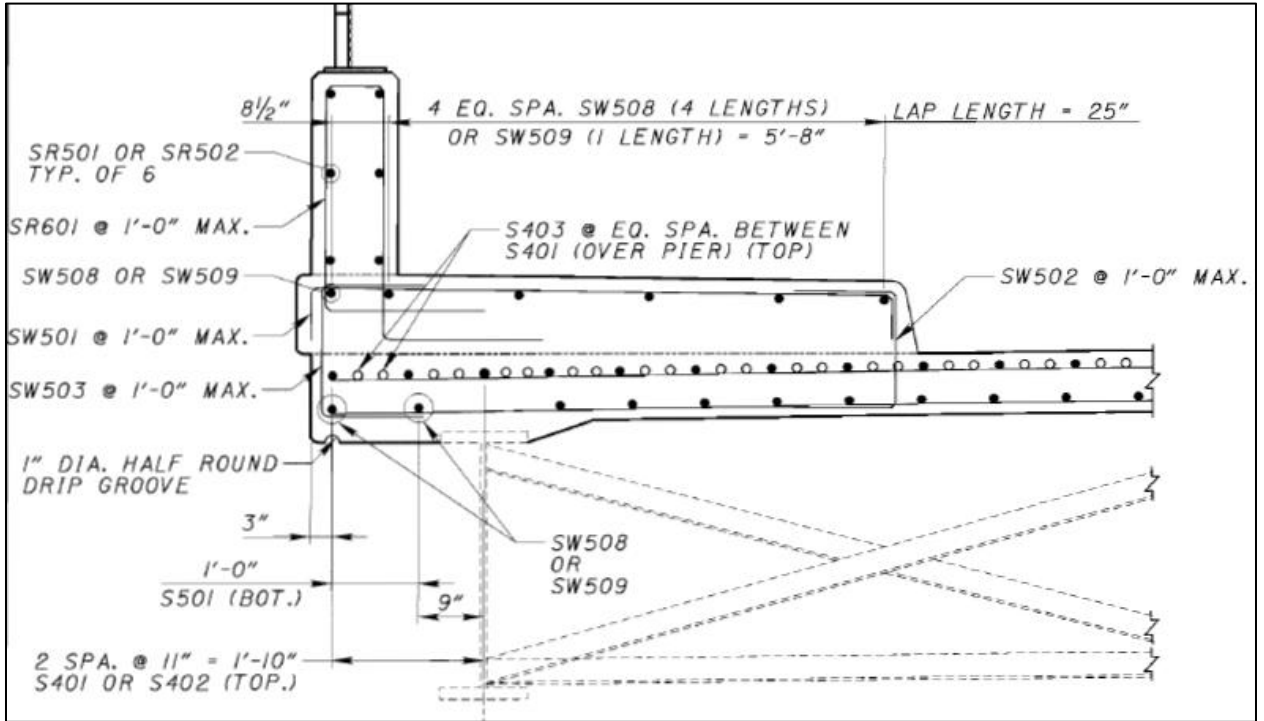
Wagar Road Construction Plans, Parapet Cross Section
